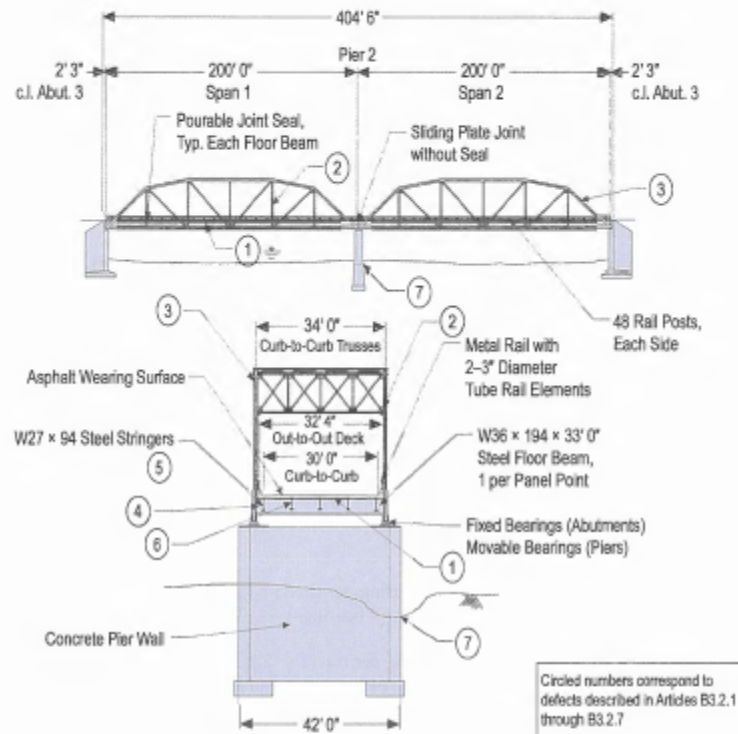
Elevation and Typical Section of Bridge for Example B.3
